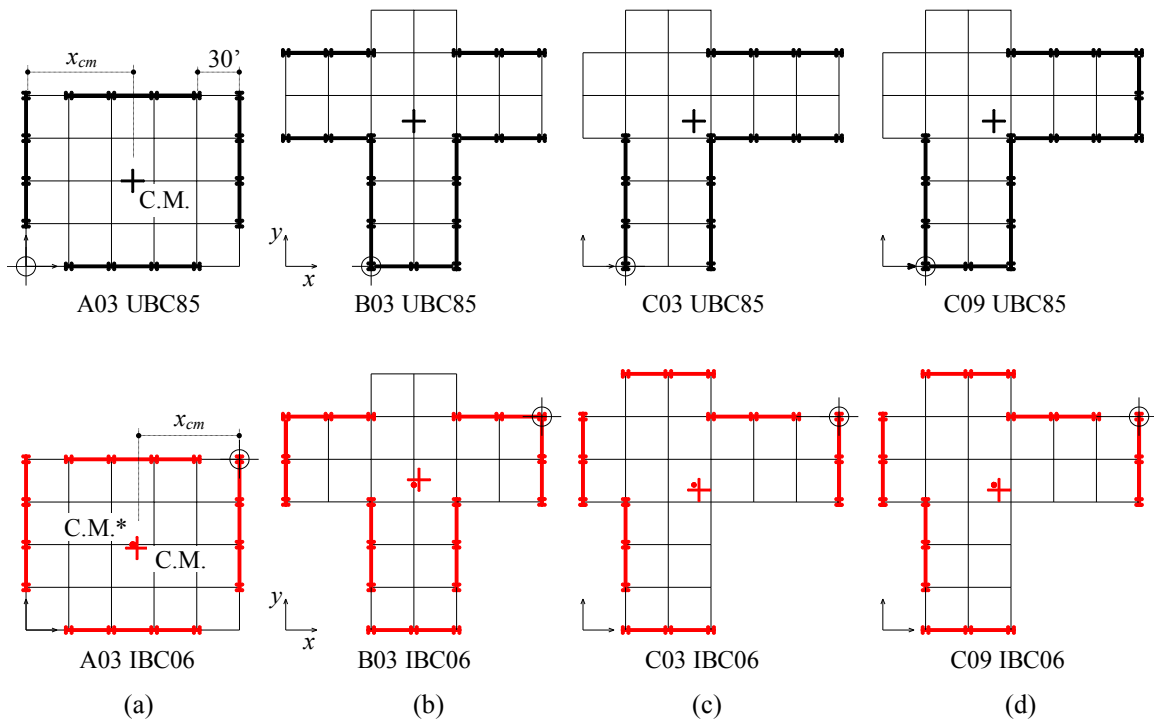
Schematic plans of the selected structural systems: (a) A03 buildings, (b) B03 buildings, (c) C03 buildings, and (d) C09 buildings designed according to UBC85 (upper row) and IBC06 (lower row); moment resisting frames are highlighted.
